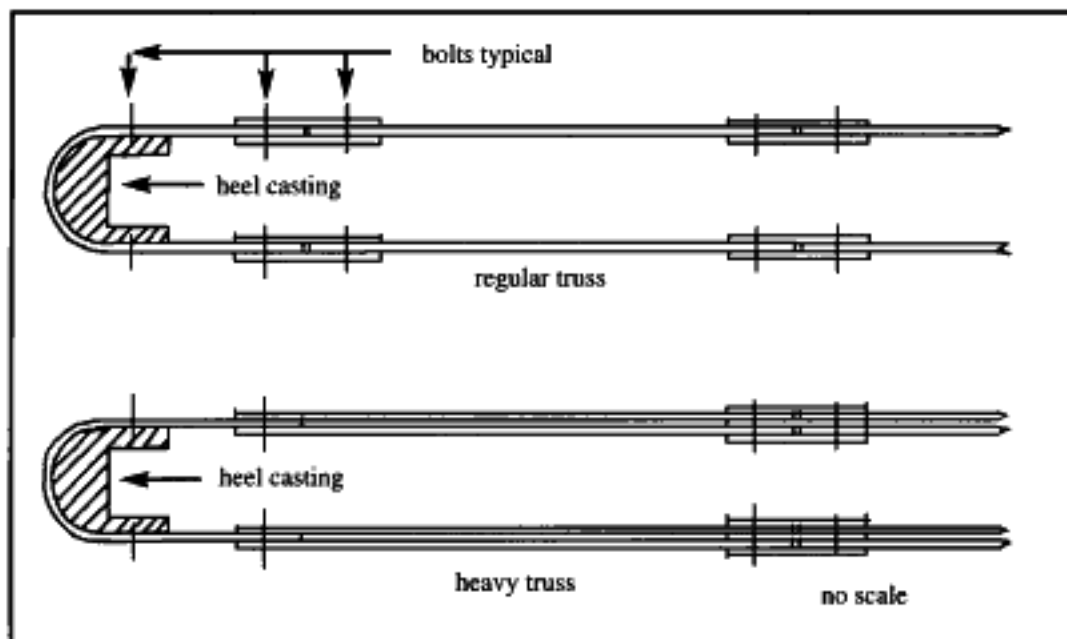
Bottom chord splices and connections to the hoops that bear on the casting at the bottom of the end posts. Sketch by author.
